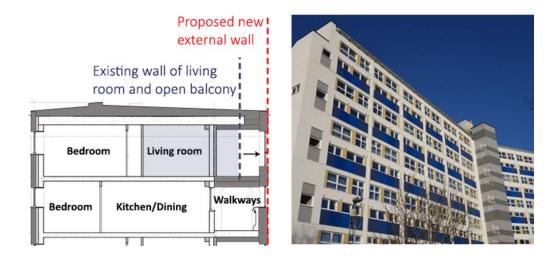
The proposed rear façade of Wilmcote House (ECD Architects, 2012).
